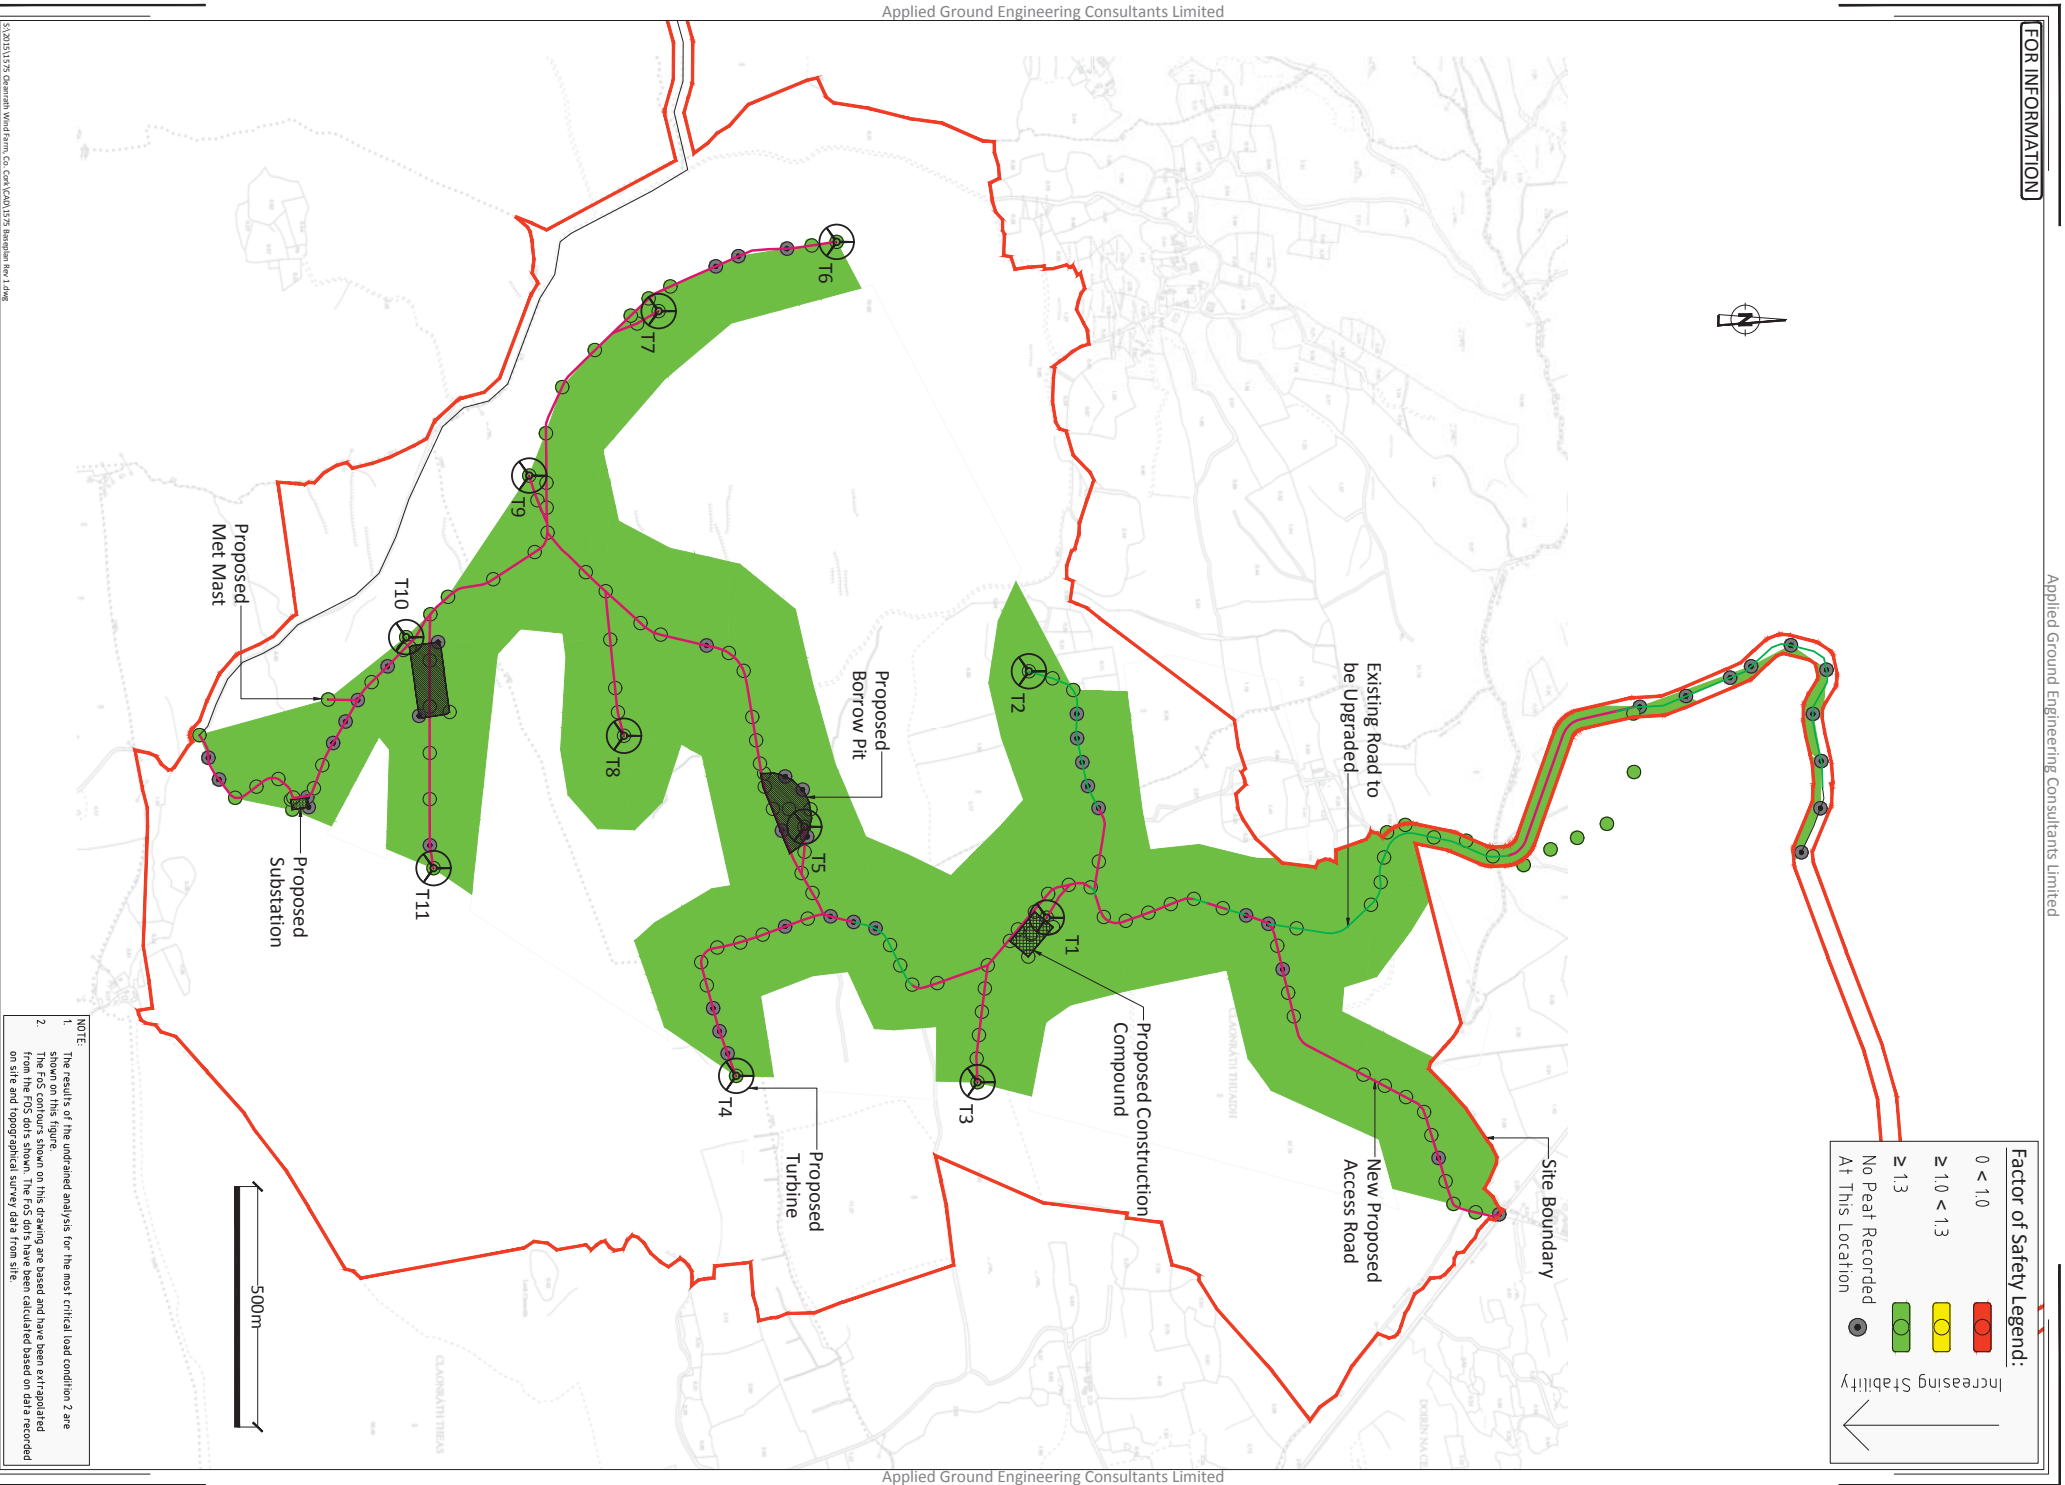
Factor of Safety Plan - Short Term Critical Condition (Undrained)
